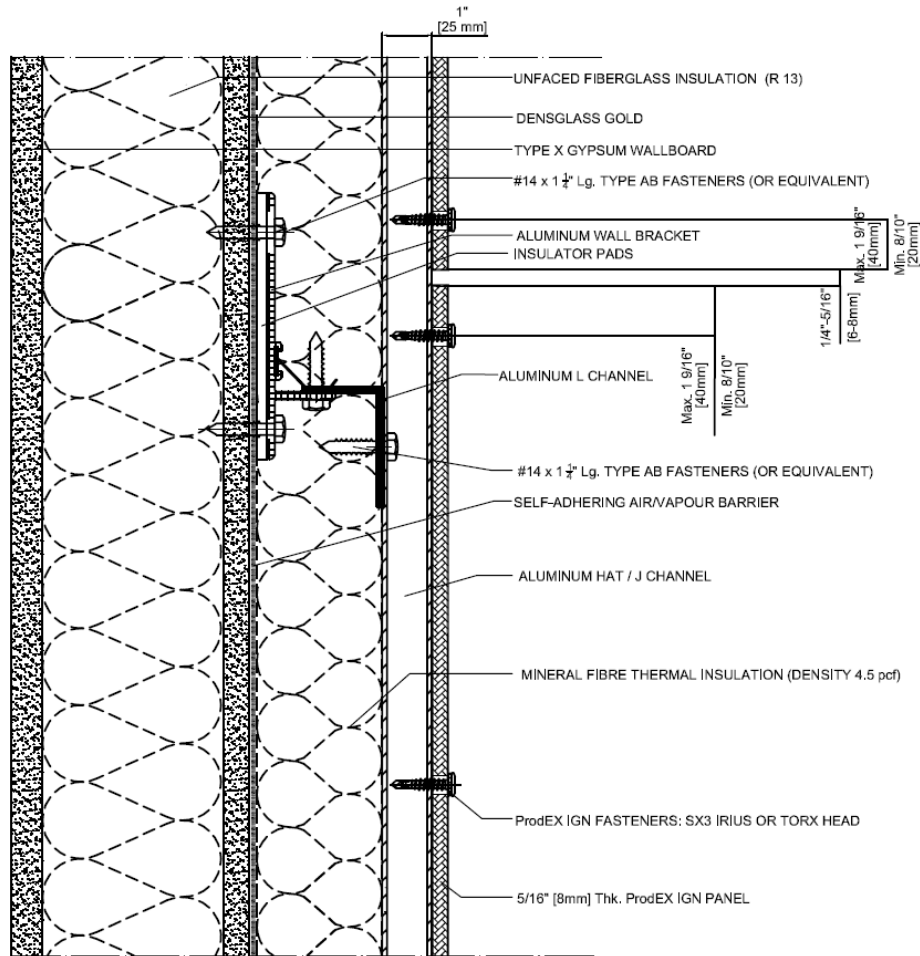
PRODEX IGN DETAILS FOR CONSTRUCTION TYPES I - IV HORIZONTAL JOINT TYPE I-IV CONSTRUCTION—EXPOSED FASTENING SYSTEM WITH J-CHANNELS AND HAT CHANNELS
